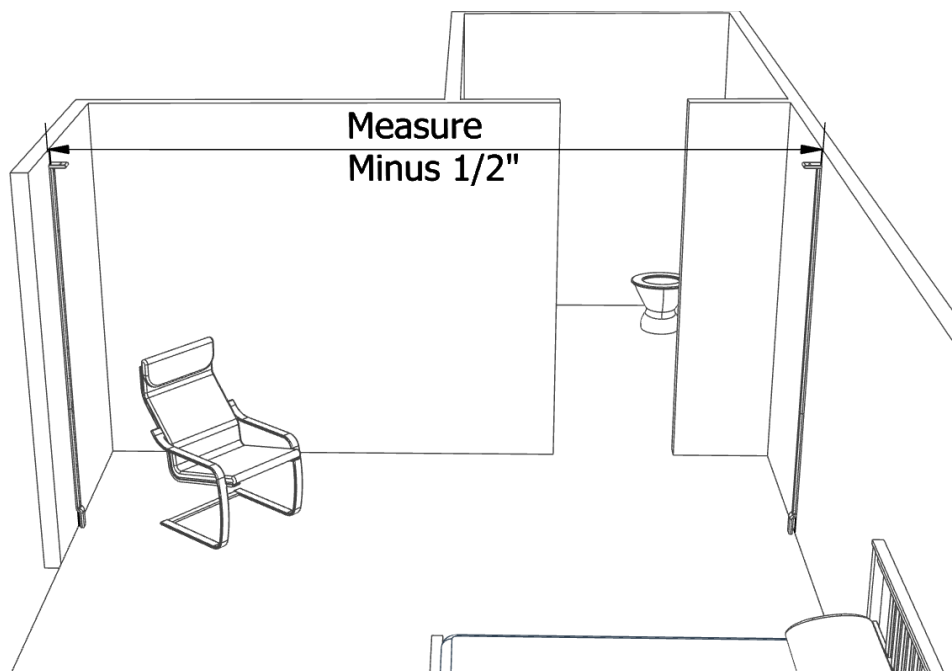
Wall to Wall Measurement from the Center of the Posts
